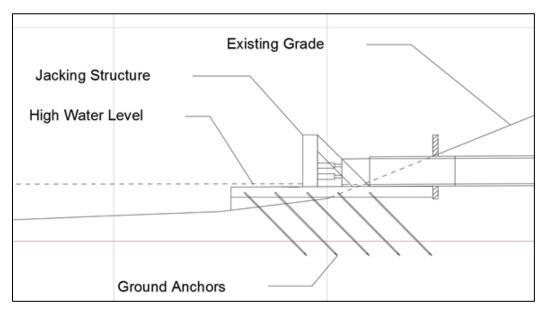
Ground Anchor arrangement for jacking (Source: Michael Louws, 2017)
